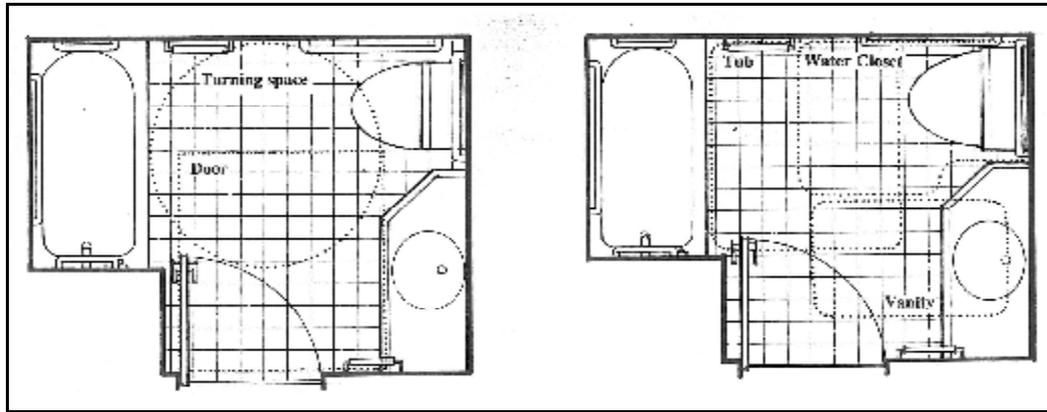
Bathroom plans with required clearances.(DECHIARA, 1991, 380).
